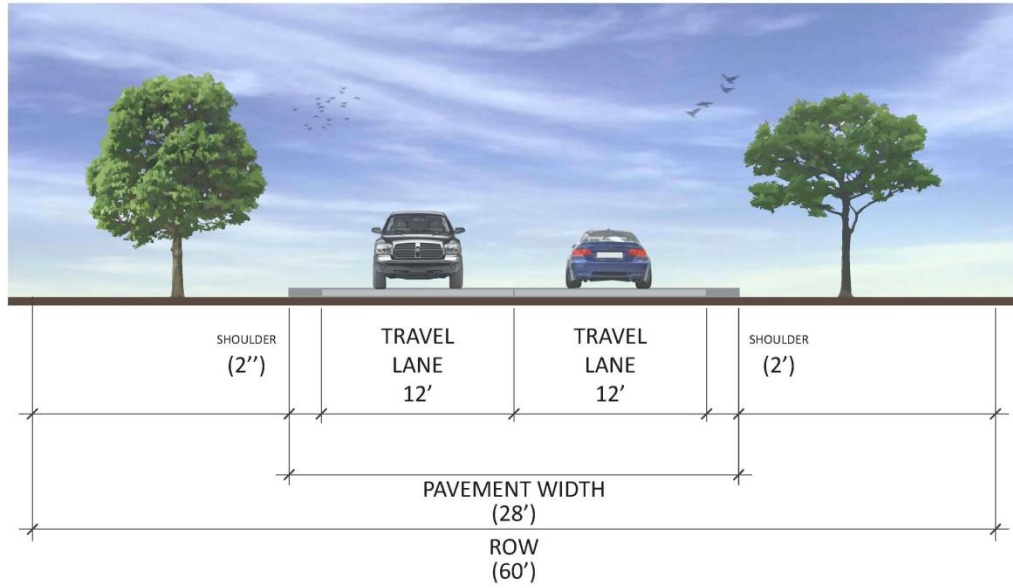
Rural Major and Minor Collector Street Cross-Section
